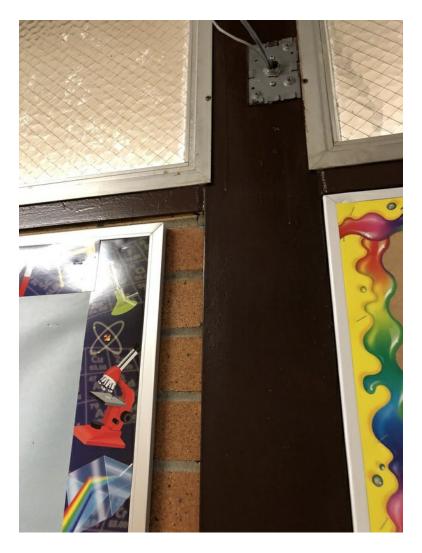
Face of WF column, brick infill corridor wall with steel channel cap
